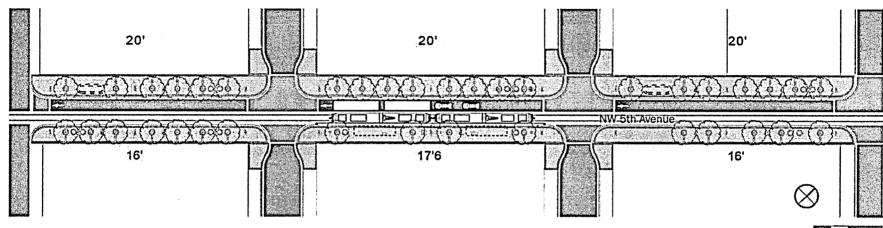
Option B - Right Side Platforms. Section of North Mall Station Block. View of 5th Avenue looking south.
